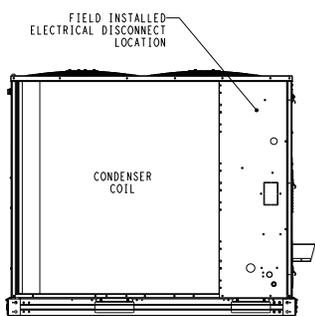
Unit Dimensional Drawing, Size 07, Single-Zone Electric Cooling with Gas Heat (cont)
